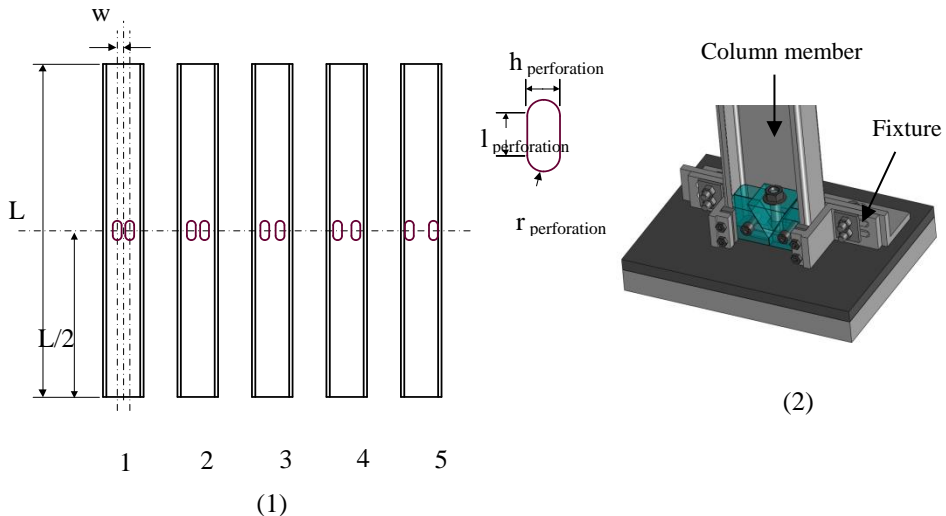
(1) Perforation shapes and positions & (2) Fixed-end fixture
